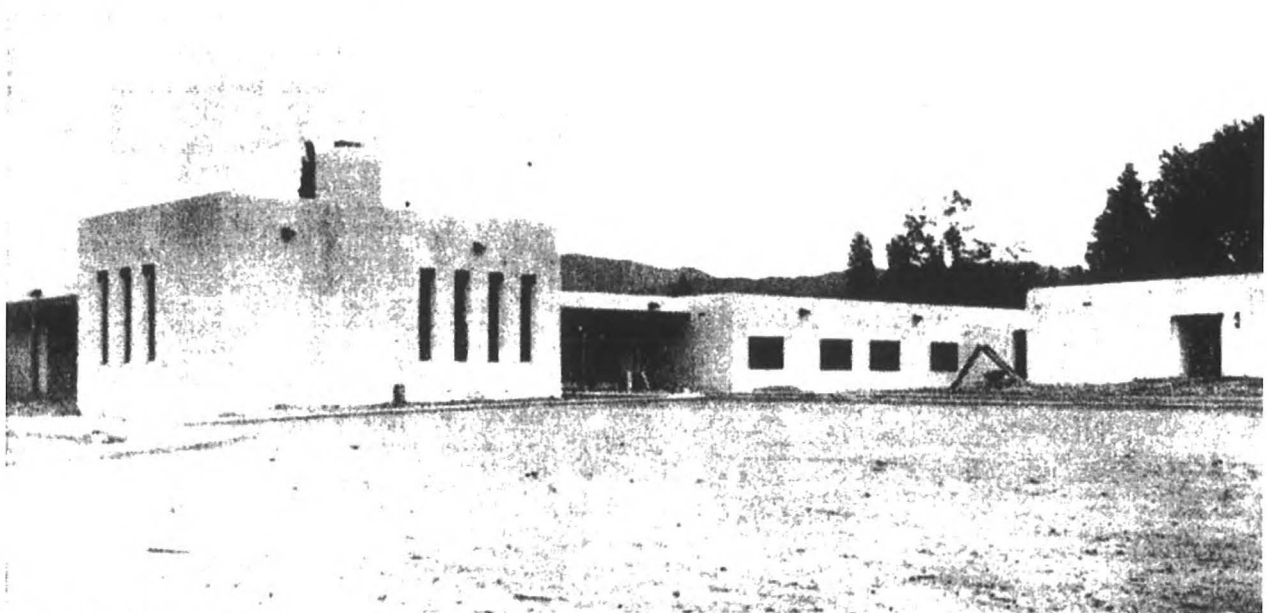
Casa Grande under construction, showing original south façade, May 1961. Courtesy *San Fe New Mexican*.
